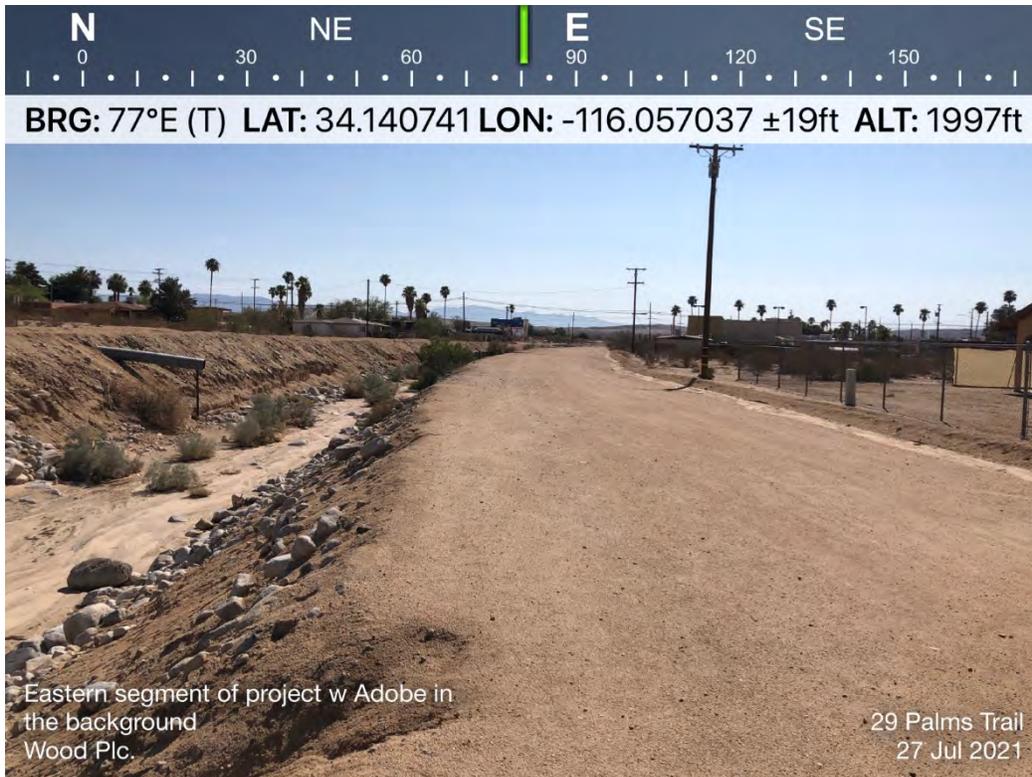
Existing dirt road on top of bank where new trail will be installed.
